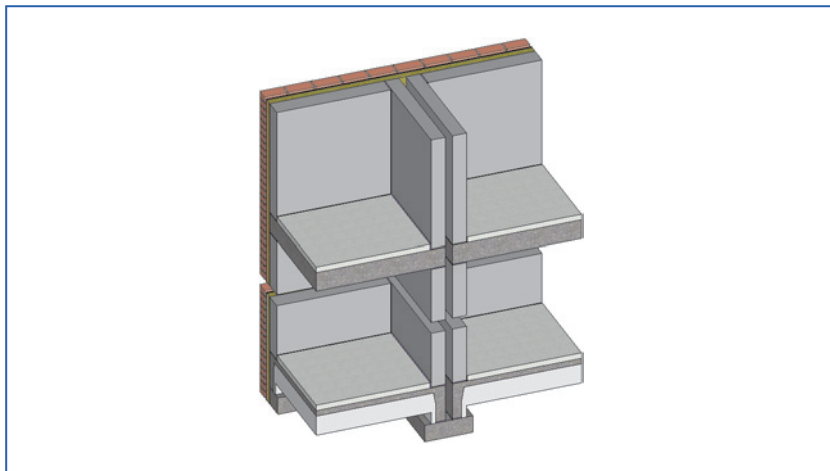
Building with interrupted floor slabs and masonry cavity separating wall. [[2] - (Belgium)].
